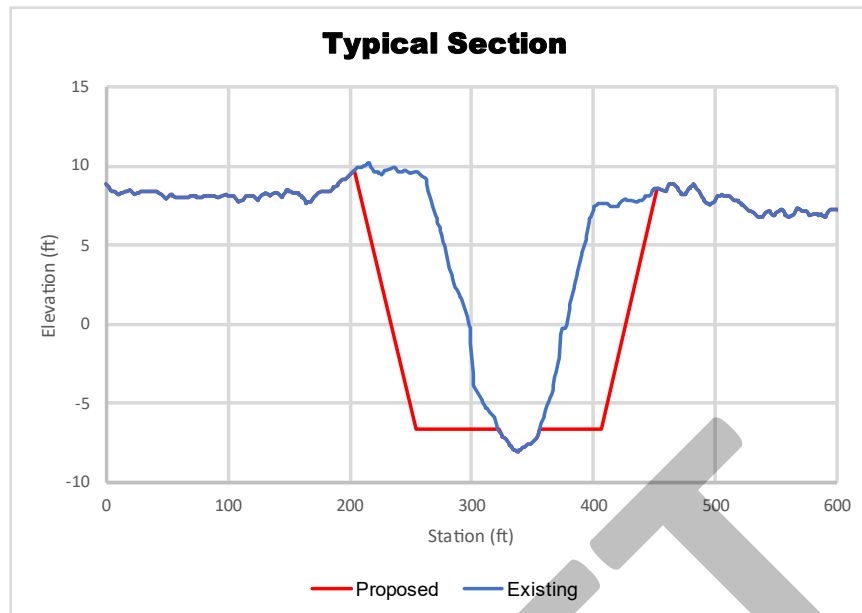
WILLOW MARSH DOWNSTREAM TYPICAL SECTION
